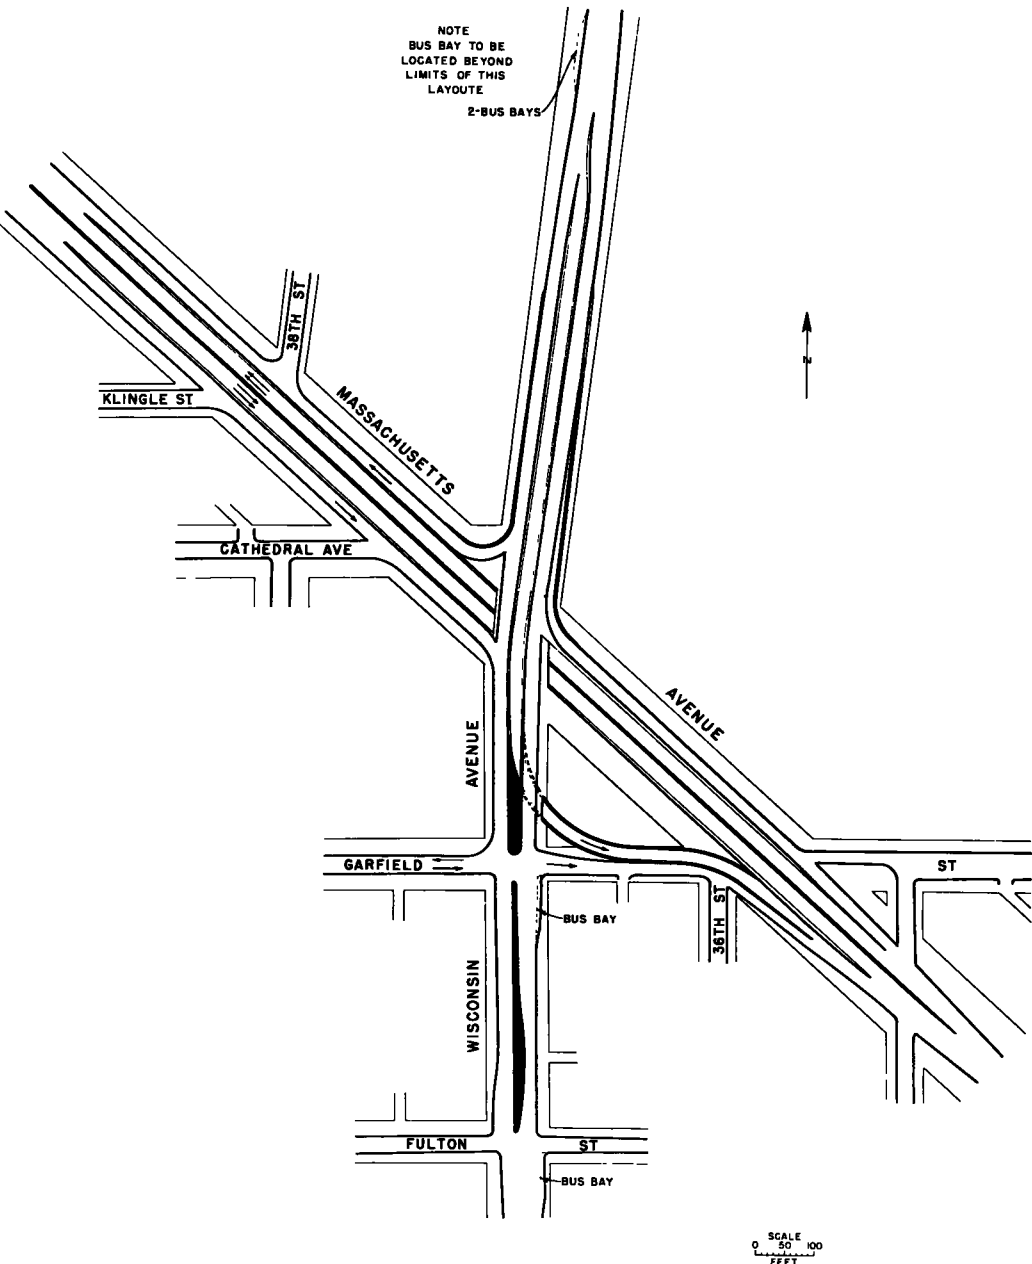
Proposed improvements: full grade separation of all movements (Massachusetts Avenue—Garfield Street).
